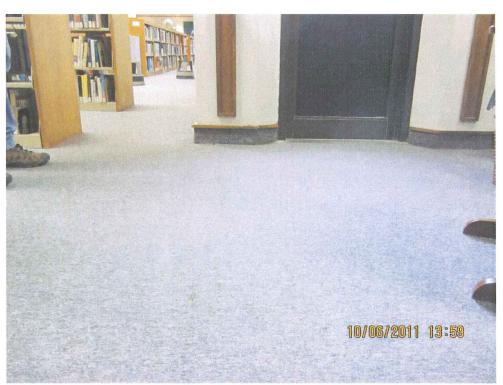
Separation of interior slab-on-grade at construction joints near emergency exit door.
